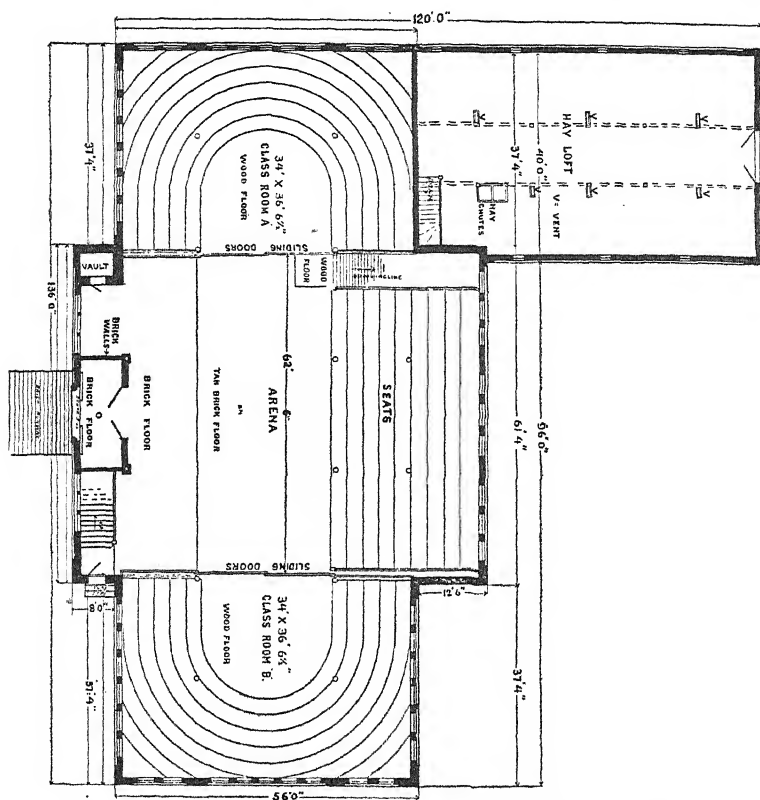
First-floor plan, live stock building, Minnesota College of Agriculture.
